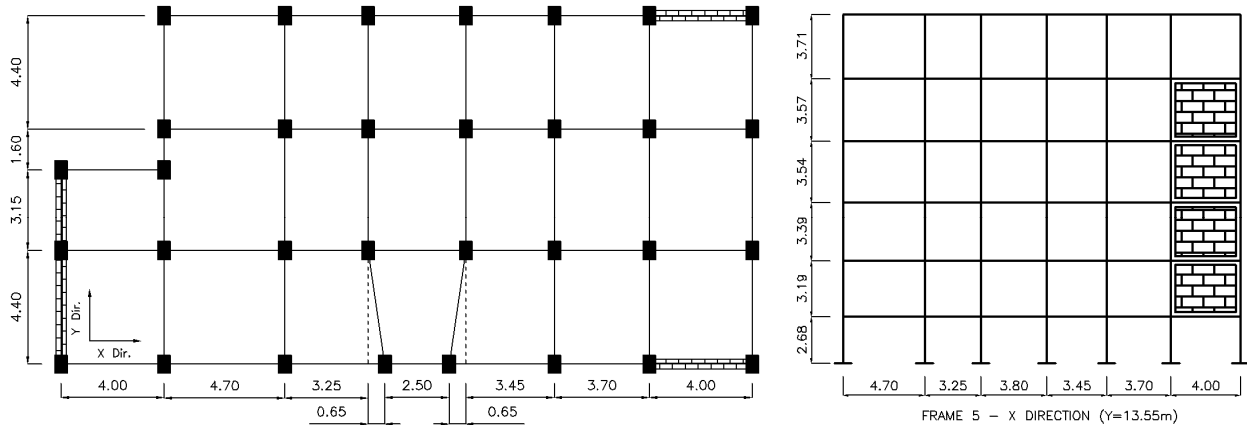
Plan view (left) and scheme of elevation for Frame 5 in East-West direction (right)
